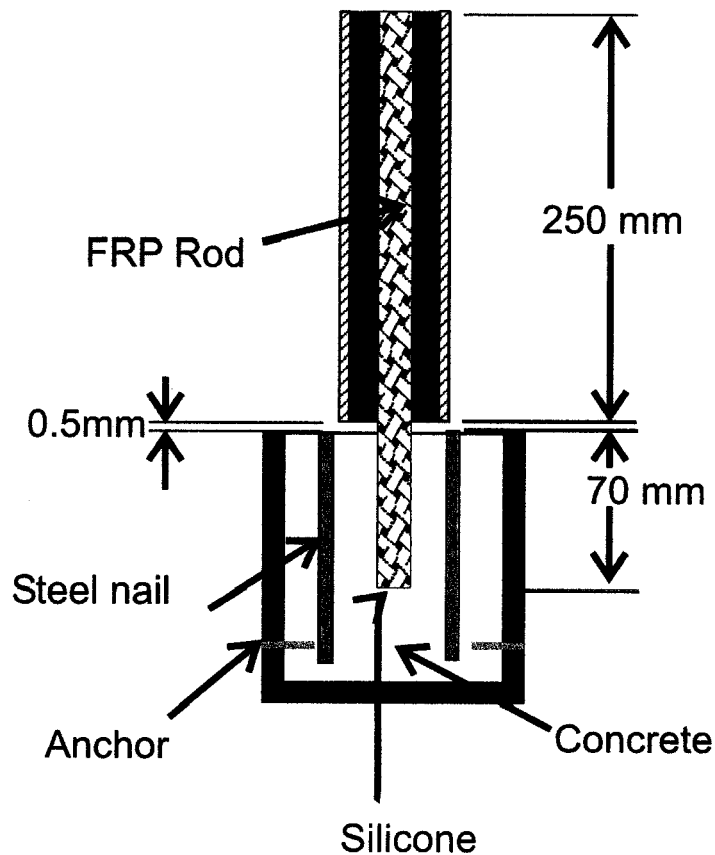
Over-wrap to concrete interface strength test specimen.
